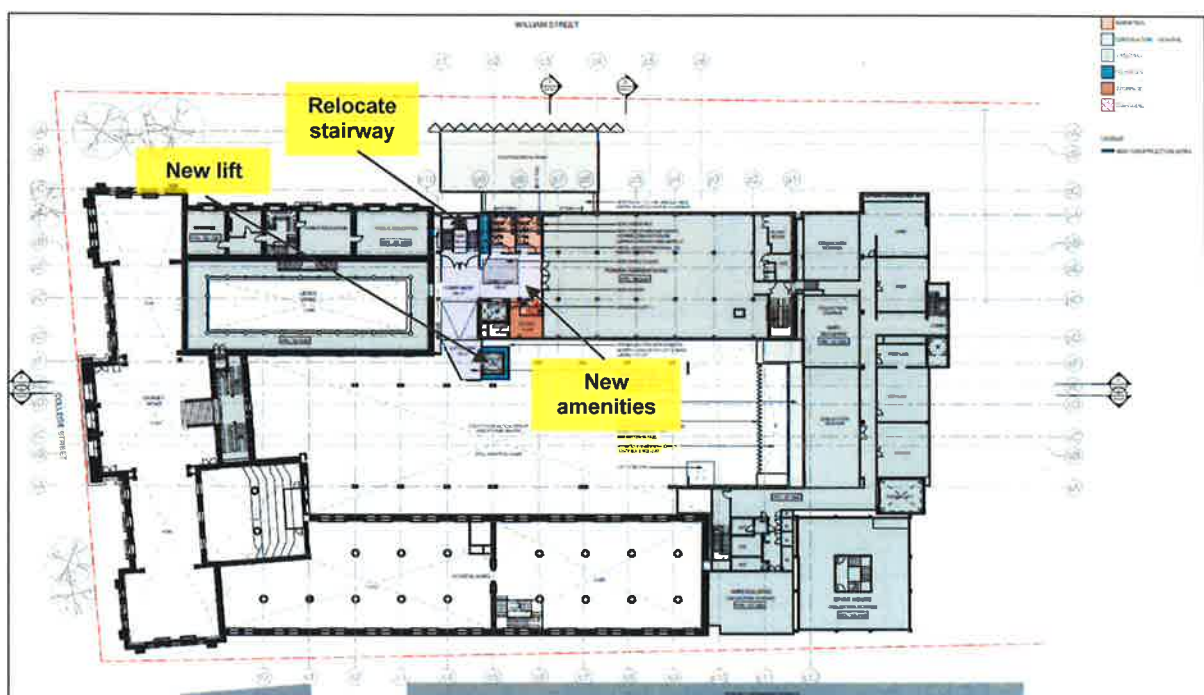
| Level 1 floor plan (Source: Applicant's RtS).
